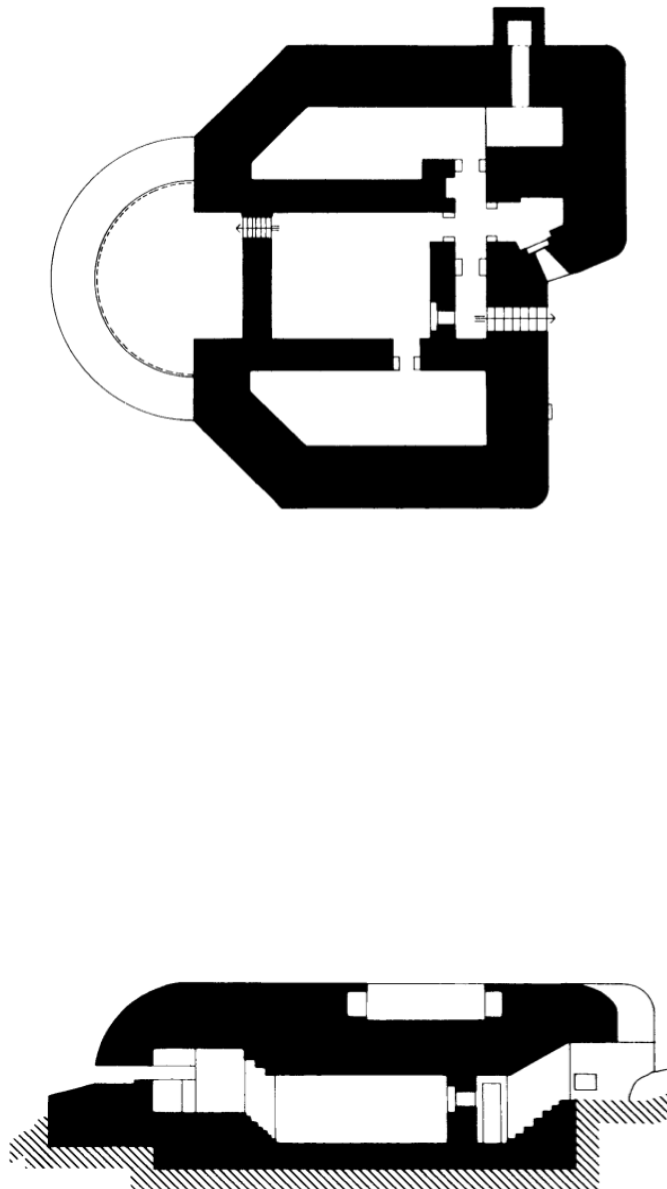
Plan and section of bunker of the Atlantic Wall, drawn by Paul Virilio
